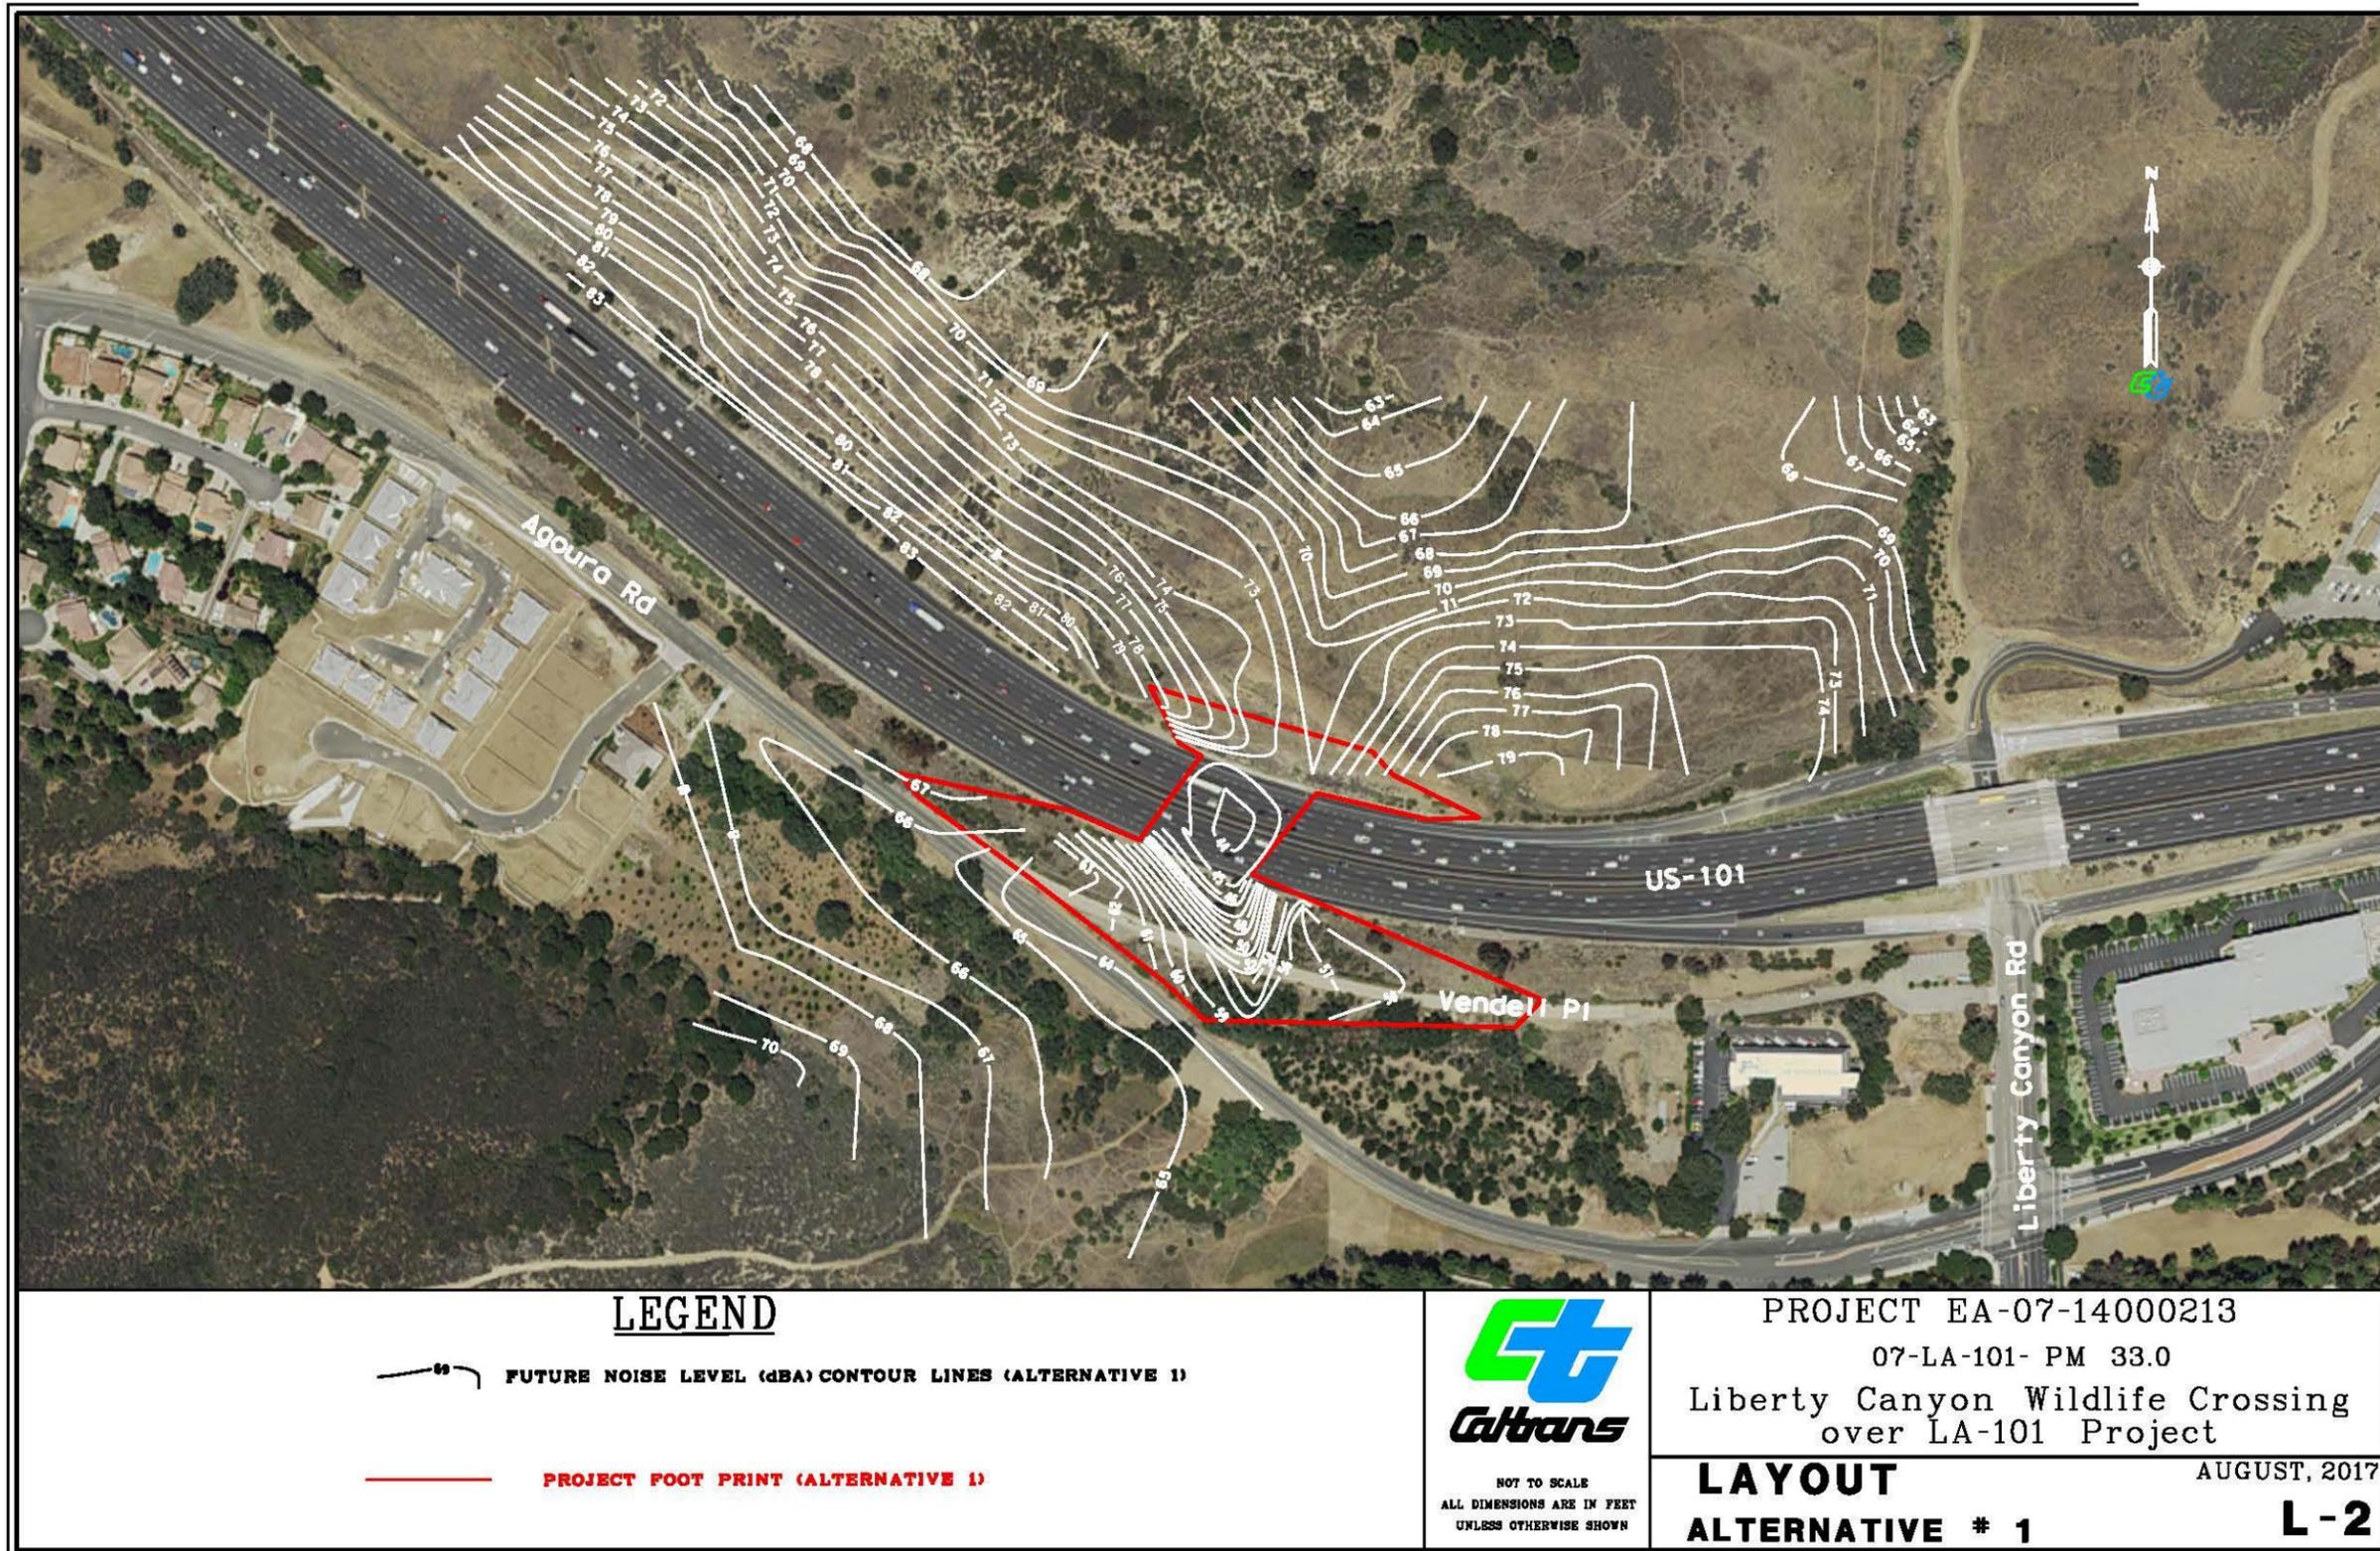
Build Alternative 1 Future Noise Level Contour Lines
